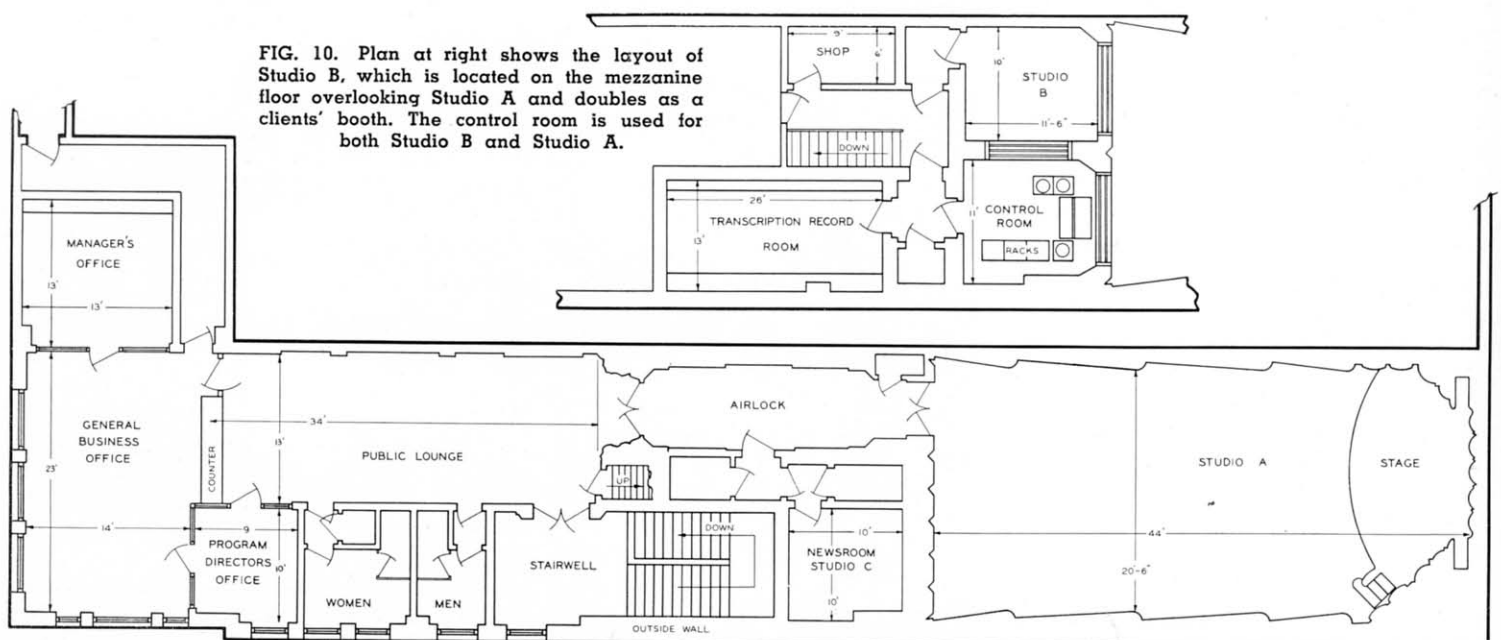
Plan at right shows the layout of Studio B, which is located on the mezzanine floor overlooking Studio A and doubles as a clients' booth. The control room is used for both Studio B and Studio A.
